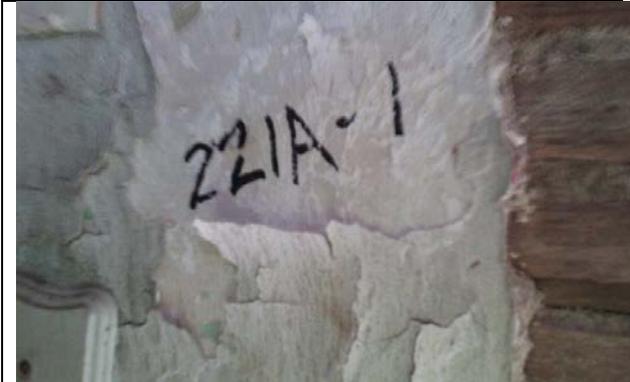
Plaster/Txt Paint (221A-1) Living Room, Wall A.
